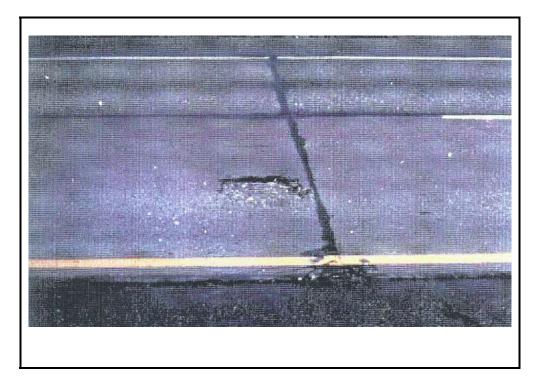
Pressure Damage in Jointed Concrete Pavement
